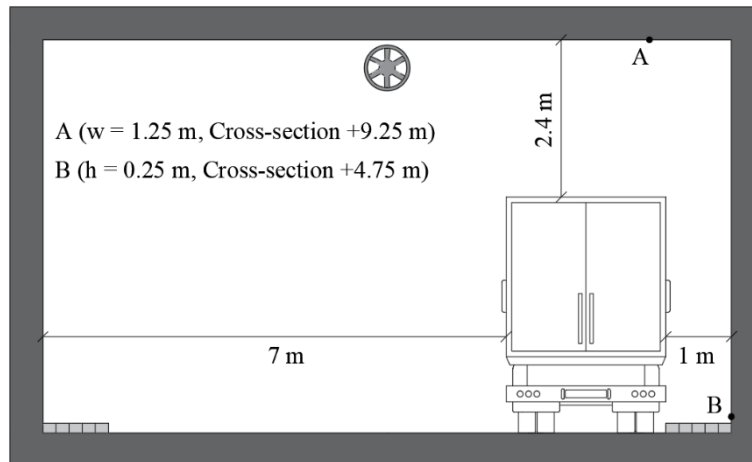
Locations of points A and B where the maximum spalling depths are predicted beneath the ceiling and along the right wall, respectively.
